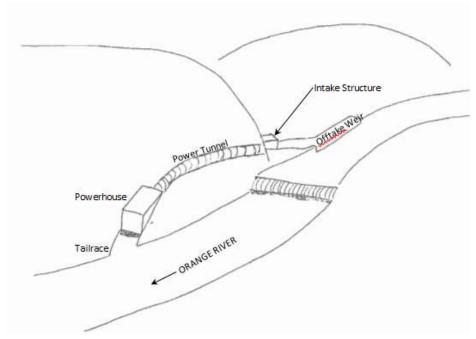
| Sketch of the tunnel alternative at Boegoeberg
